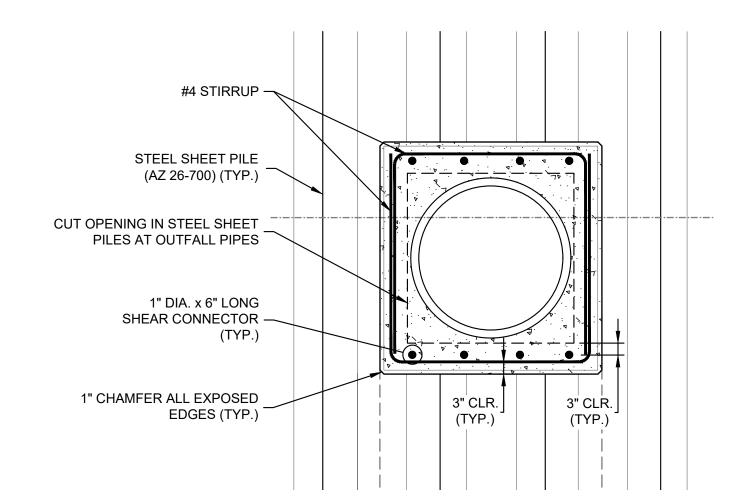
DETAIL - OUTFALL BULKHEAD PENETRATIONS TYP. (STA. 0+25, 1+12, 1+90)
